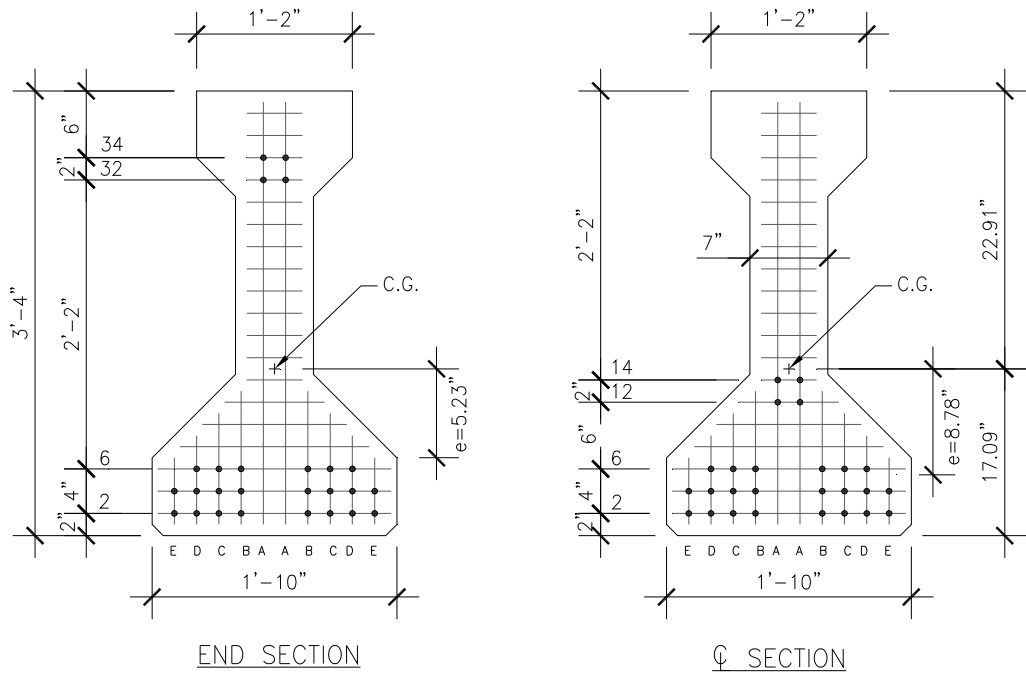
Series 1 Beam Dimensions and Strand Pattern
